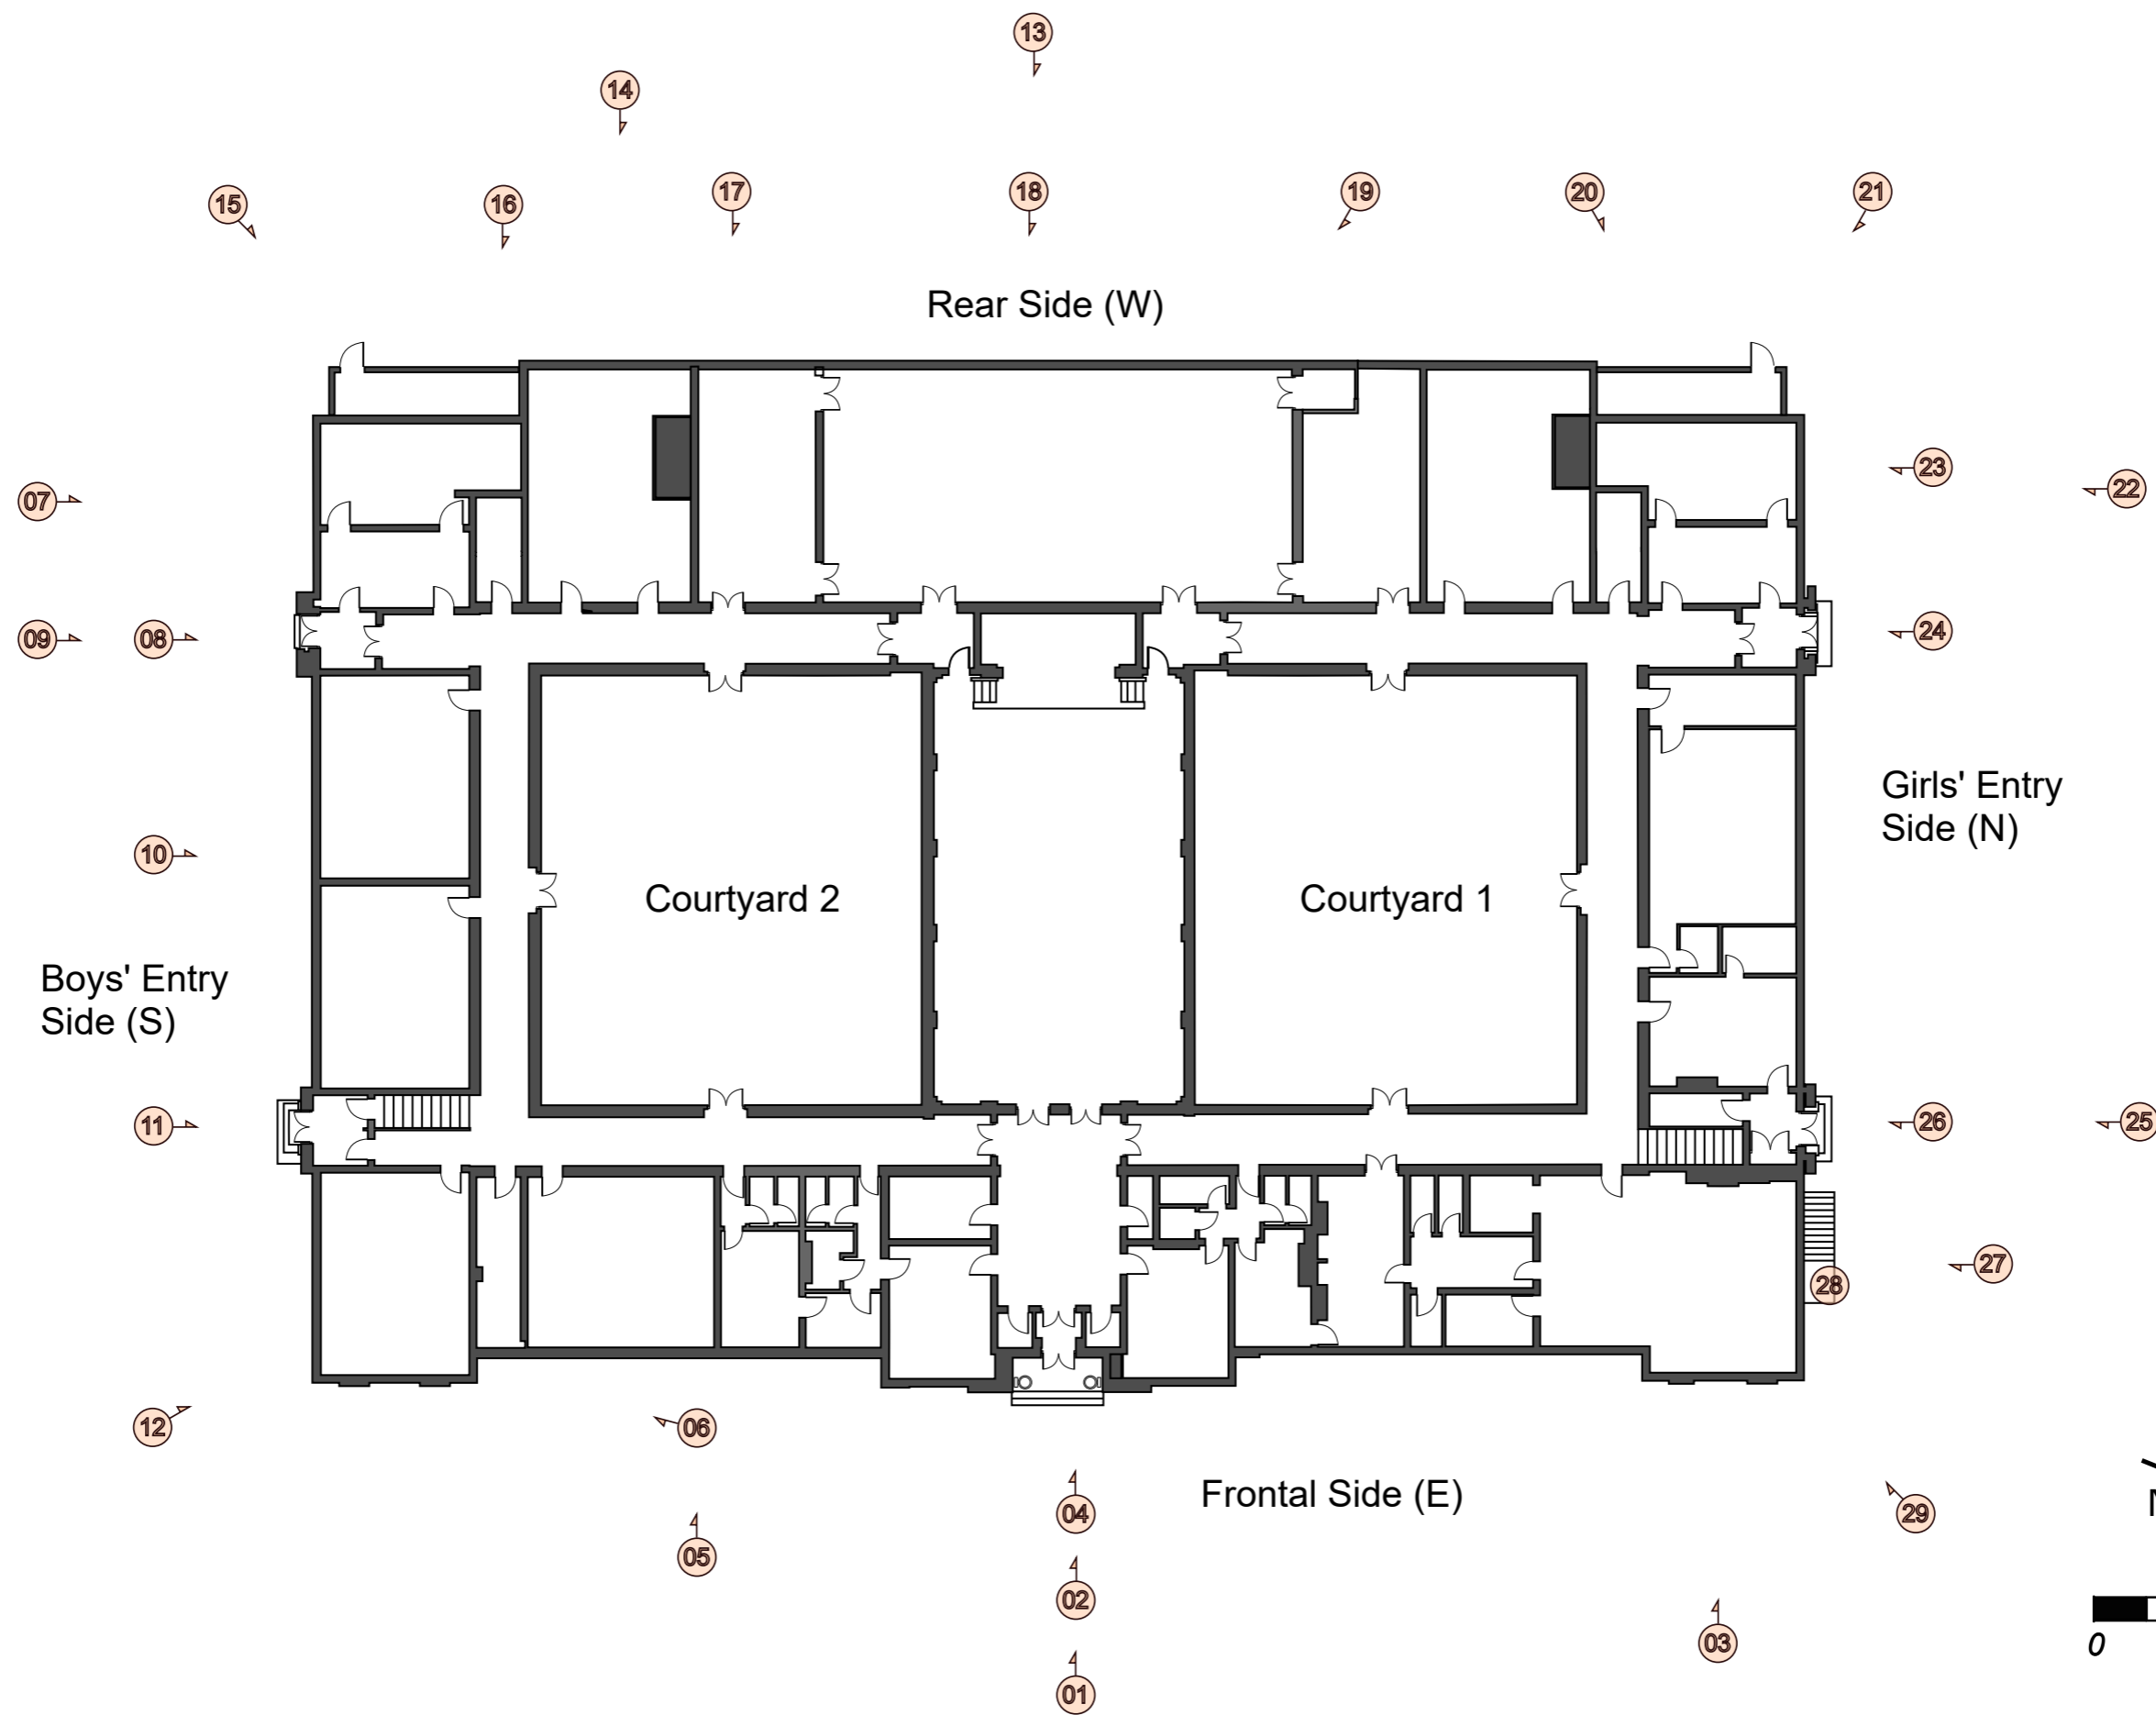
Plan of existing ground floor with number and direction of shots taken from the exterior.
